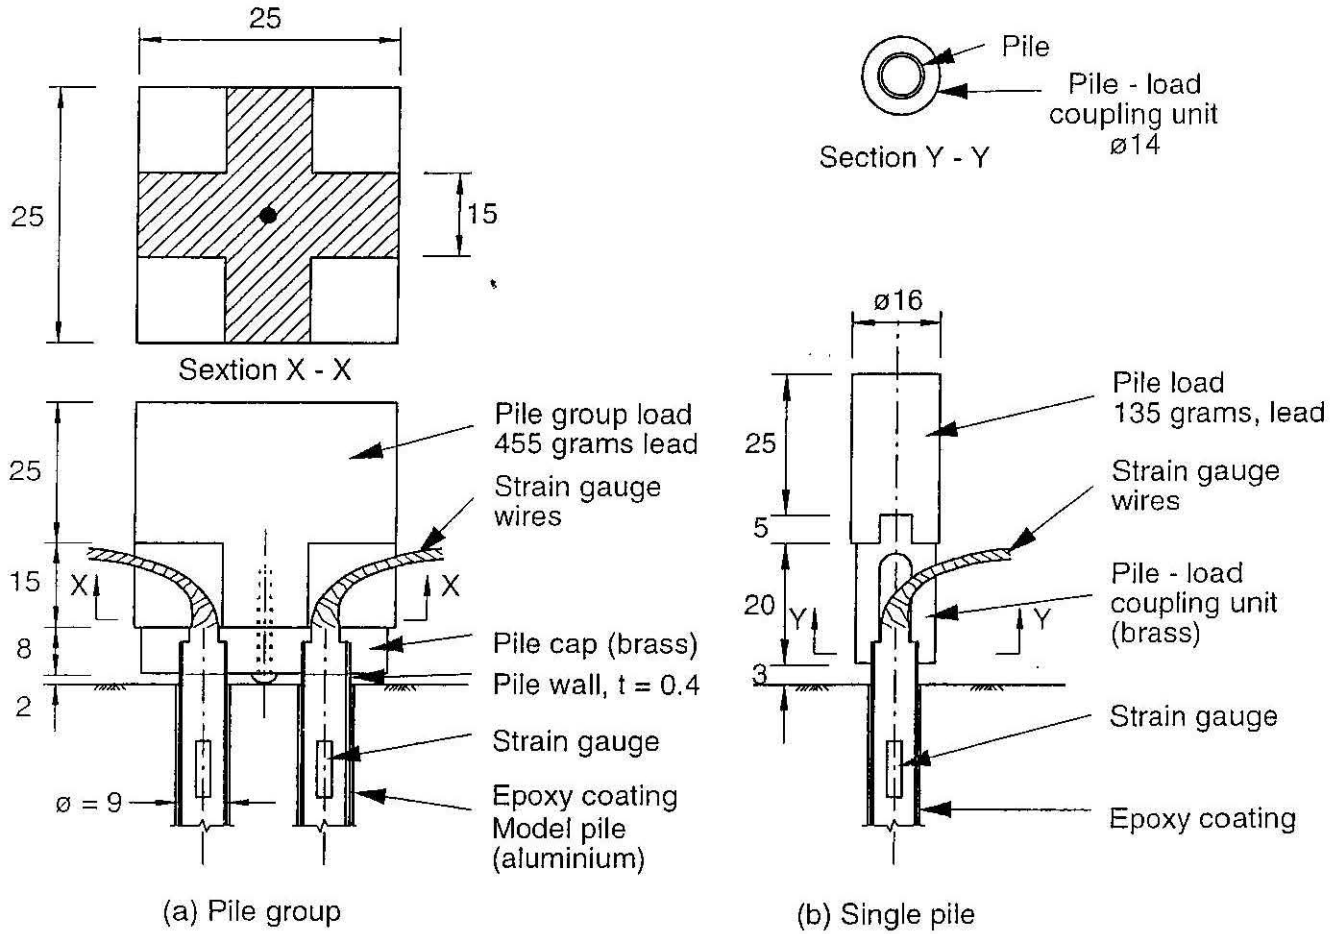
Instrumented Model Piles (dimensions in mm)
